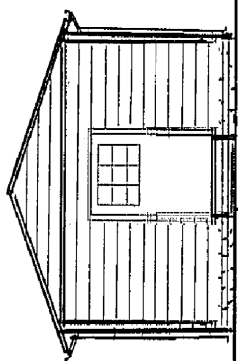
Framing around Exterior Wall Opening using Header and Double Studs
